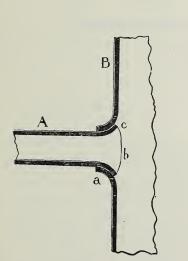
Fitting a leaden pipe to a vertical wall, accessible on the rear face.
